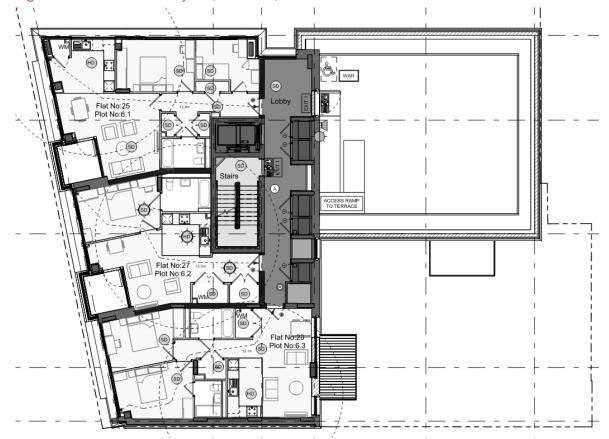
Indicative floor layout (Sixth - Eighth floor)
